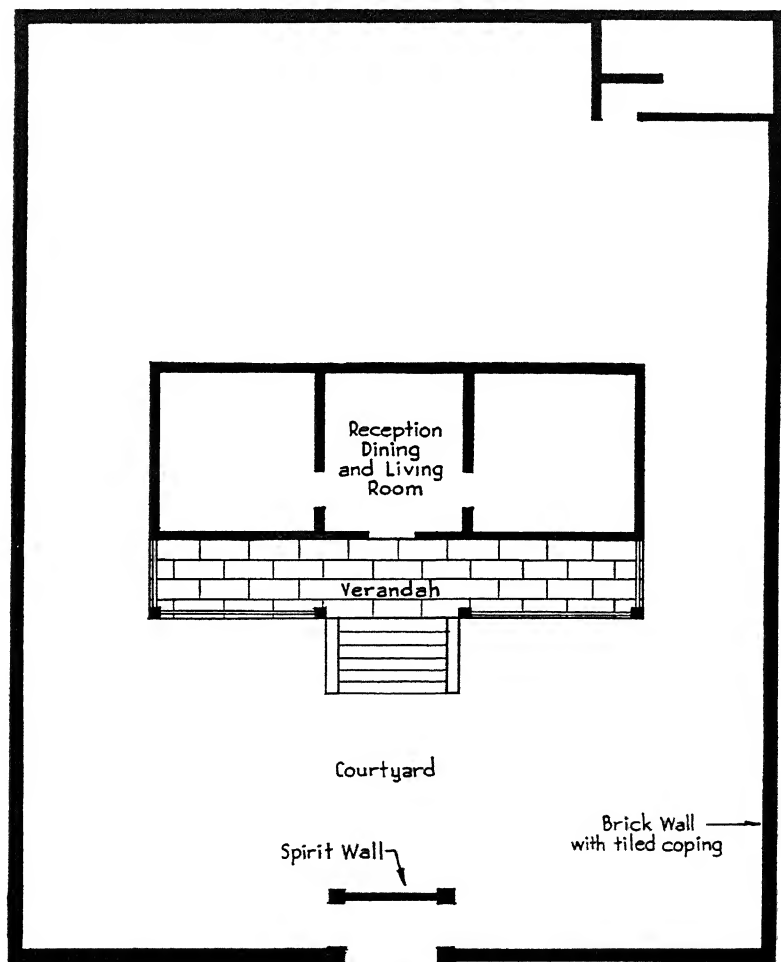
PLAN, TYPICAL SMALL CHINESE HOUSE
